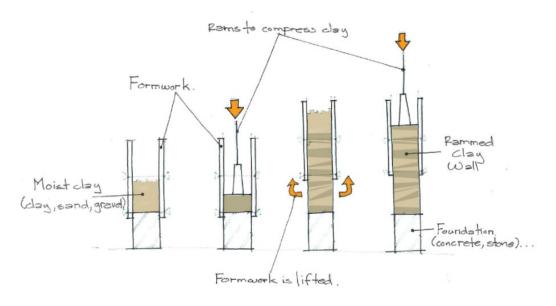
Drawing of formwork moving to build rammed earth (Escobar, 2013)
